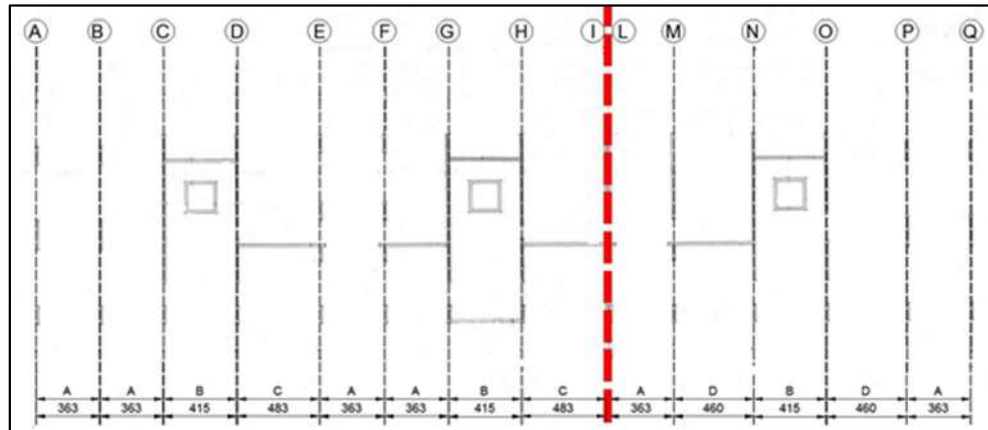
Concrete Frames Building B. Distinct “pillar floor” septa with frame numbers.
